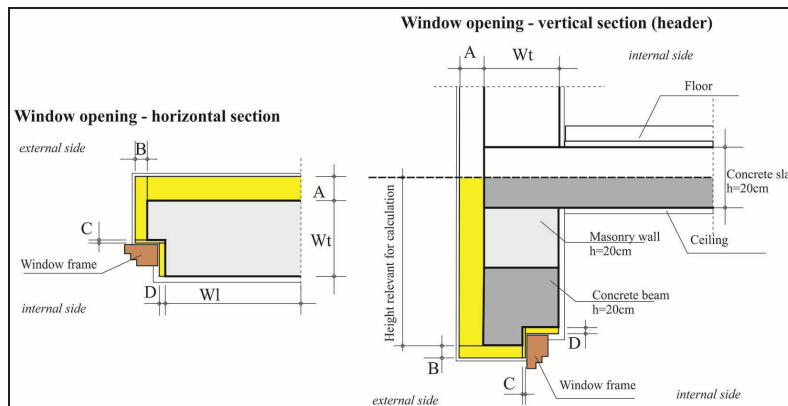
Scheme of typical horizontal and vertical section details of windows – wall connection
